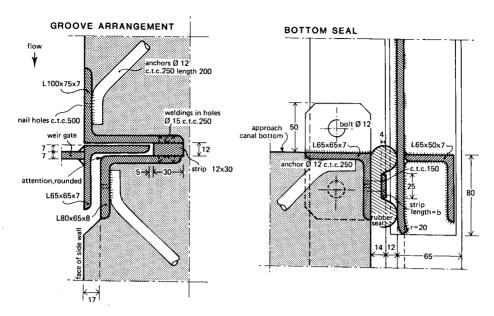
Sections showing groove arrangement and bottom seal for weir with bottom drop (dimensions in mm).
